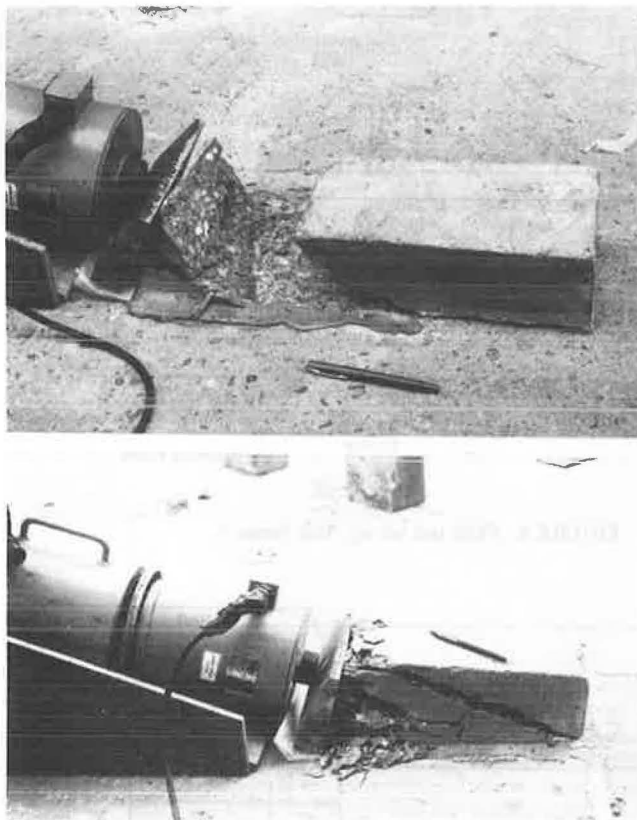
Typical failure modes, Test Series A: bond failure, unanchored specimens (top) and splitting and crushing, anchored specimens (bottom).
